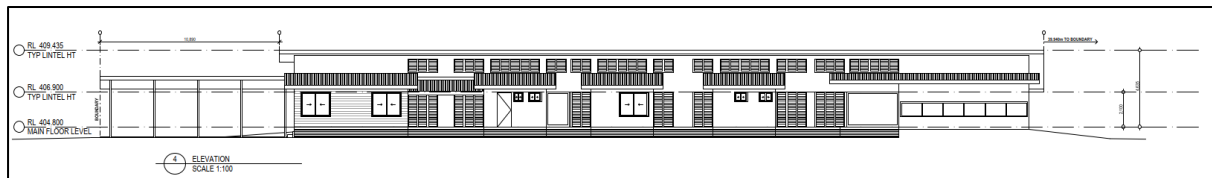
Elevations - Approval Plans (Source: Deborah Fisher Architect 2007)
